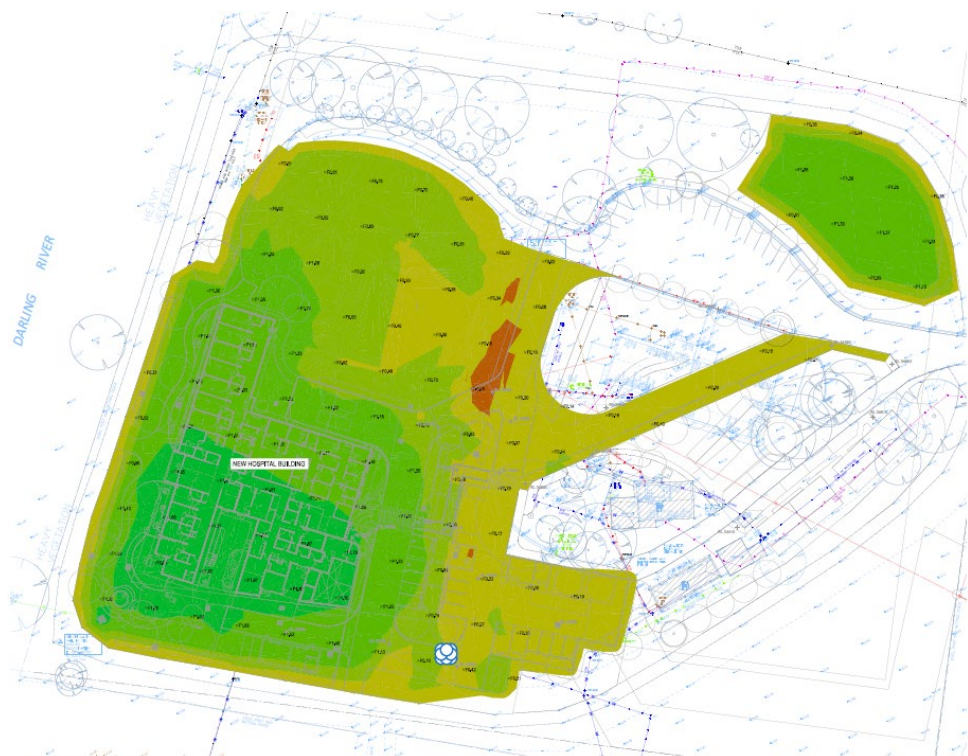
Fill Plan (Final levels) 0 - 2.04m.
